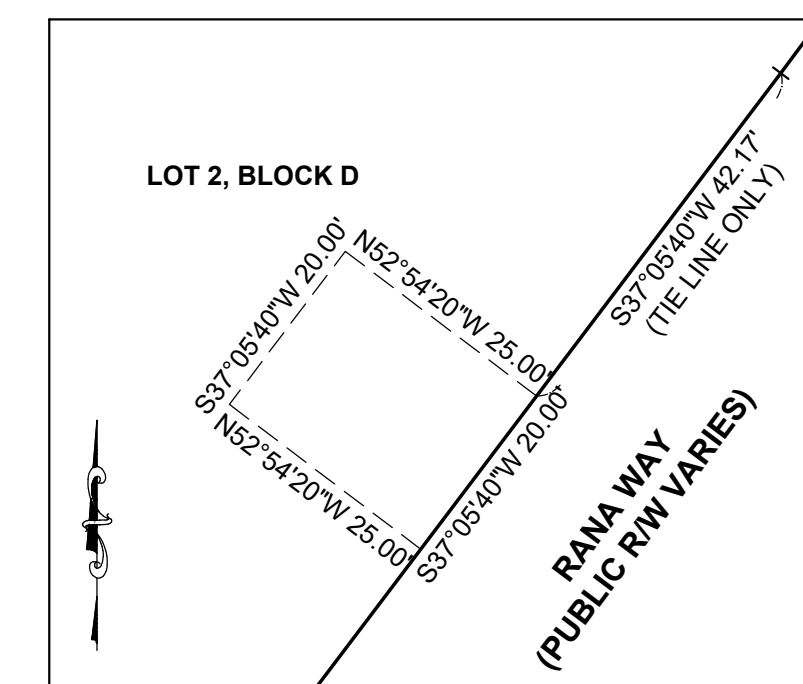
DETAIL F, PUBLIC POTABLE WATER MAIN AND SANITARY SEWER EASEMENTS (SEE SHEET 11)
